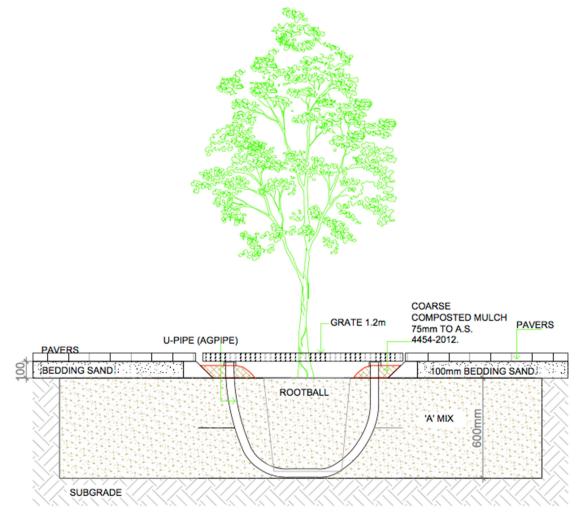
Typical cross section: Restricted space good drainage option (2 layers). Refer to Council's standard drawings for design detail.
